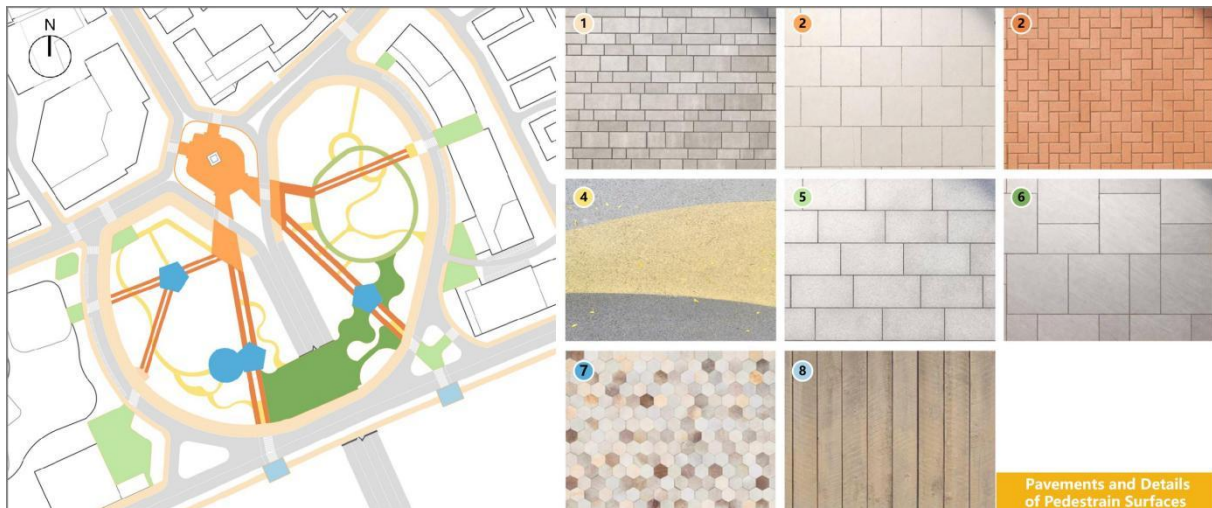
Pavements and details of pedestrian surfaces (Source: Completed by author)
